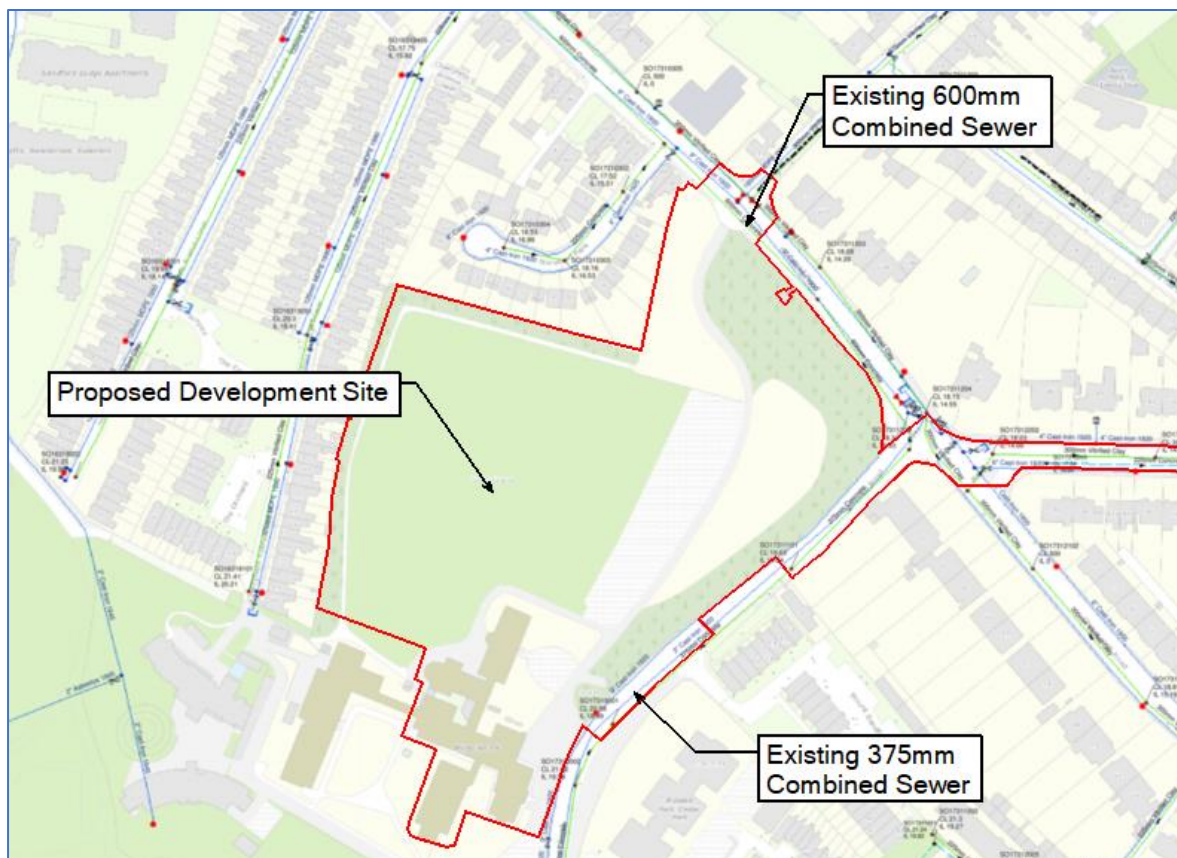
Extract from Uisce Eireann's Network Plan (Site Boundary Indicative Only)
